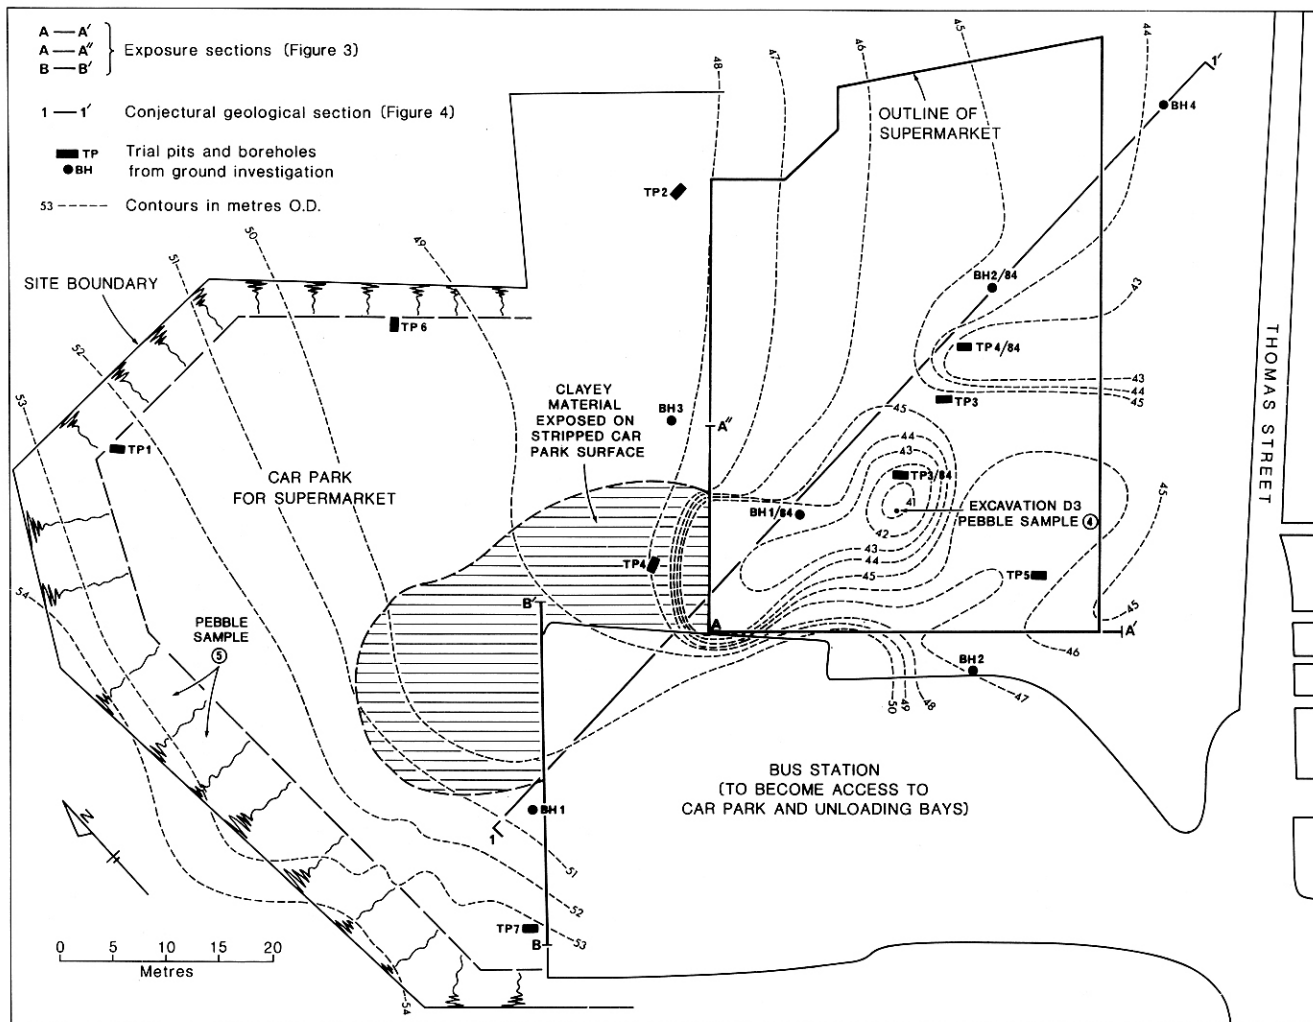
Site plan showing generalised contours on rockhead (m O.D.)
